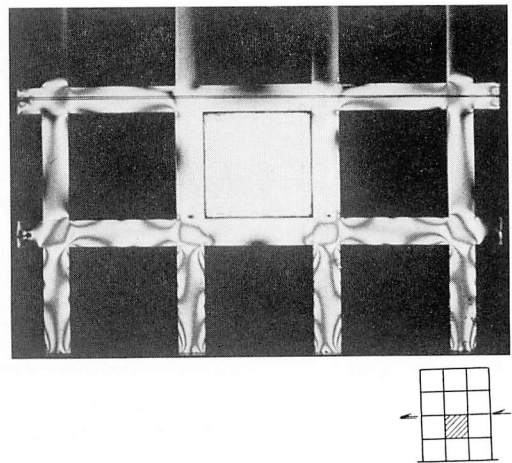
c Isochromatics of Frame with a Wall Panel Subjected to Lateral Forces on third Floor Beams
